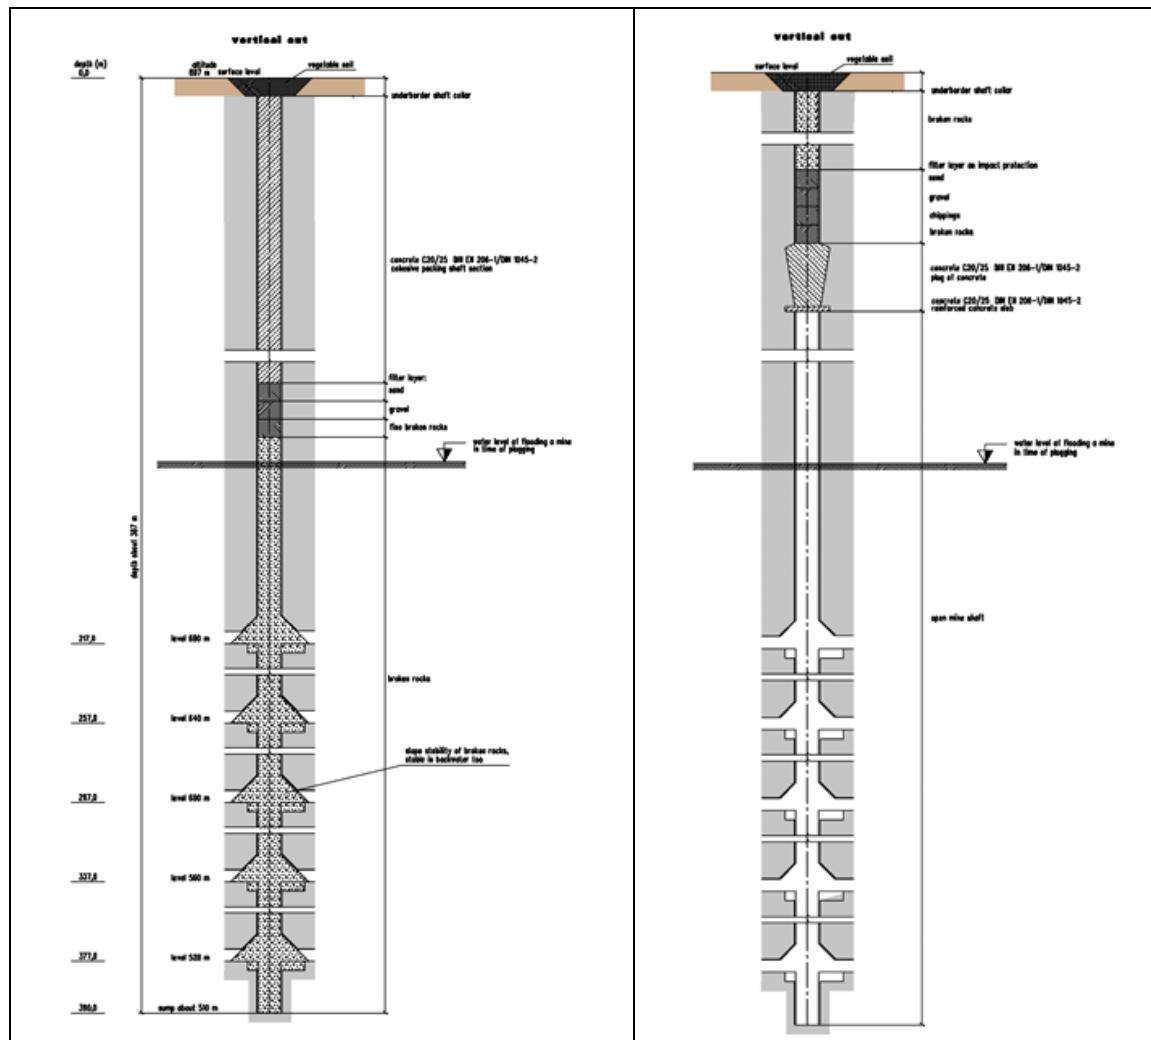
Ensuring geotechnical stability in underground ore mine closure: complete filling of the shafts. The section above the flooding level to be expected in the future must be installed as a drainage layer before the cohesive filling column reaching to the surface layer (left); partial filling (right)
